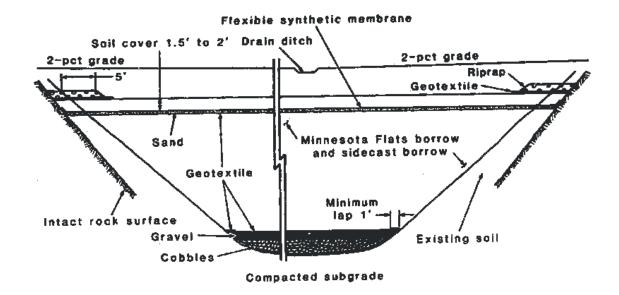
Typical section of the Brick Flat Pit cap (Biggs, 1991).
